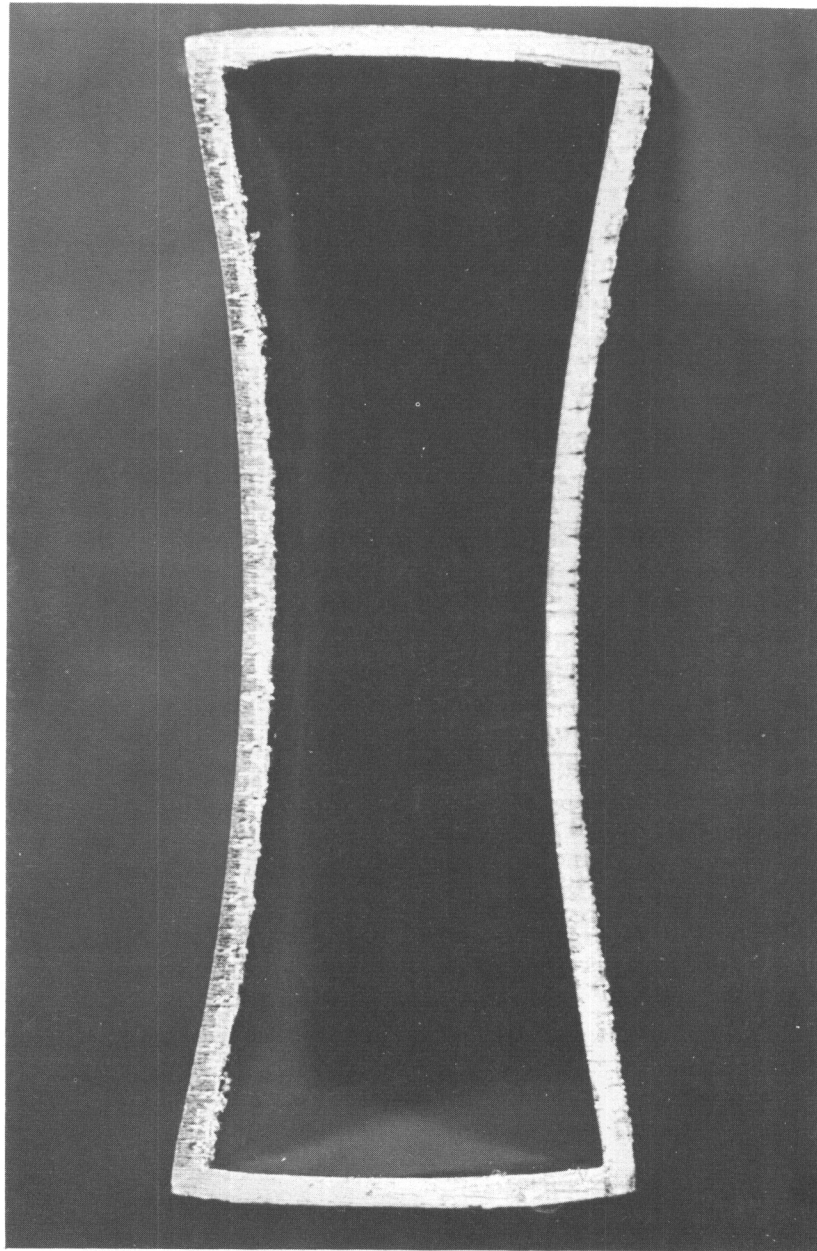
CROSS-SECTION OF HEAVILY-LOADED BOX-BEAM AT CENTER SPAN
